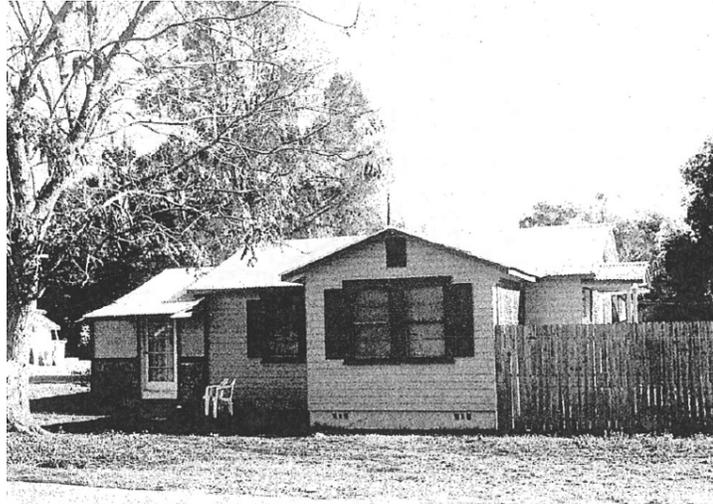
South and west elevations of 38541 1<sup>st</sup> Avenue (8PA1009). Ca. 1999.
